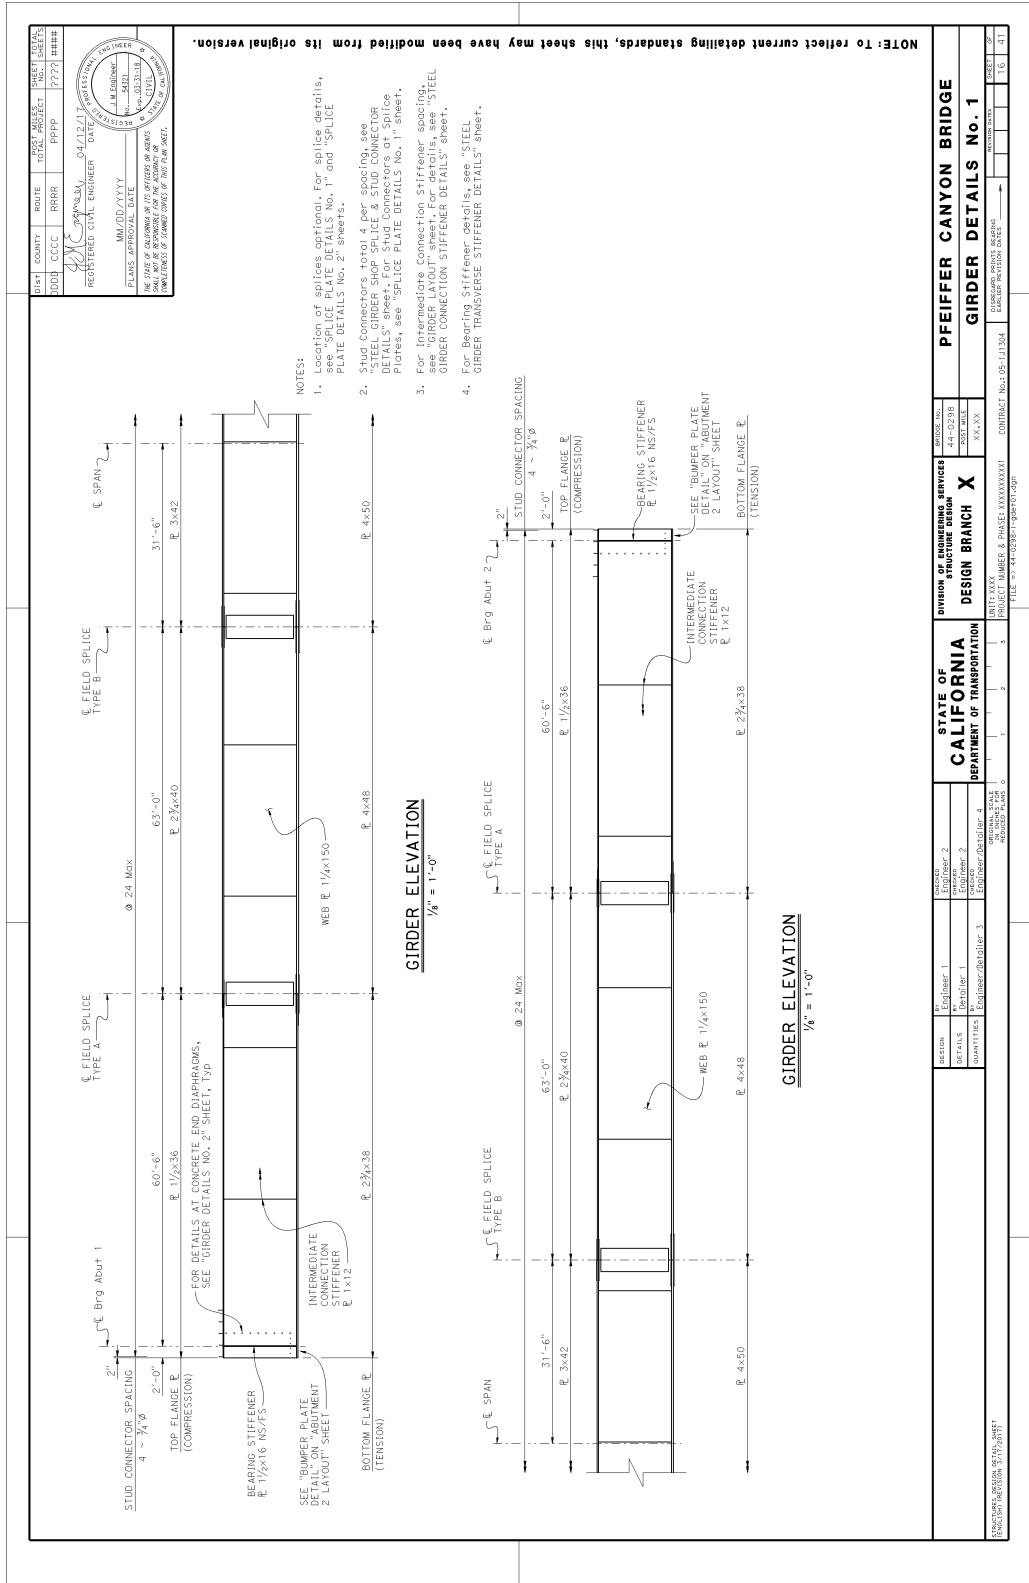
A.A.2 Steel Girder Bridge Detailing Example 2
